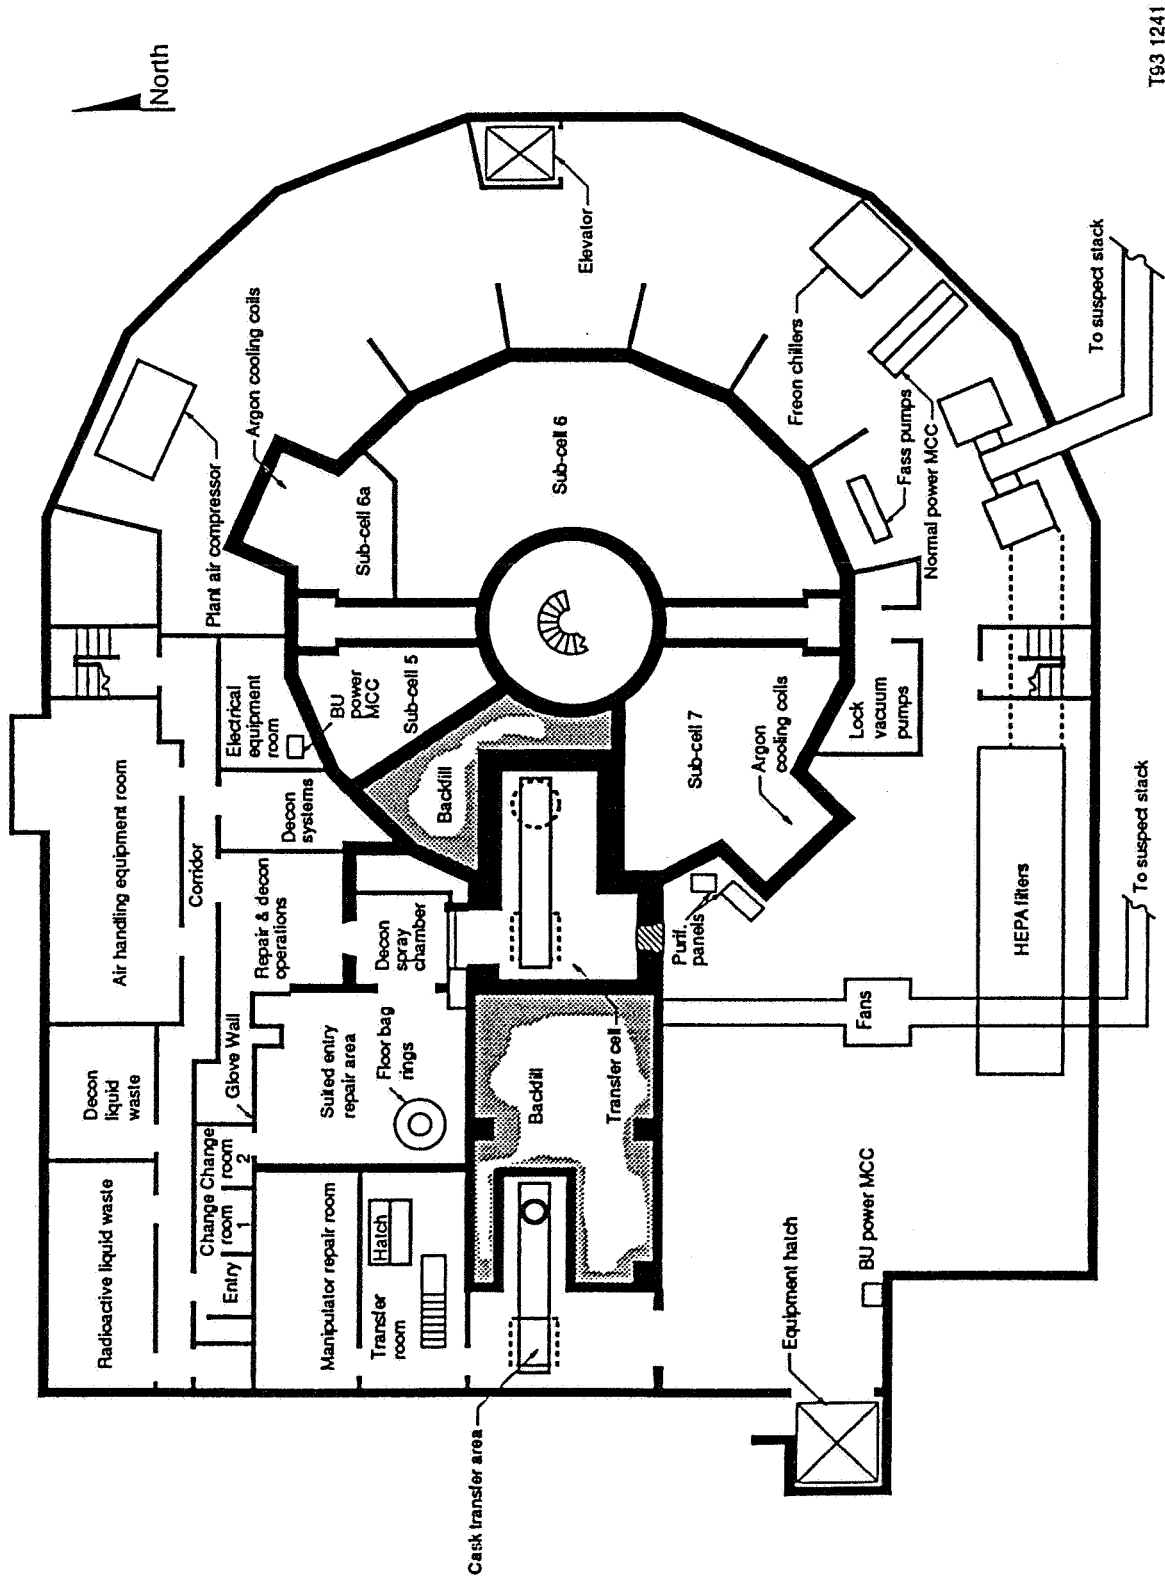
Fuel Cycle Facility basement floor plan.
